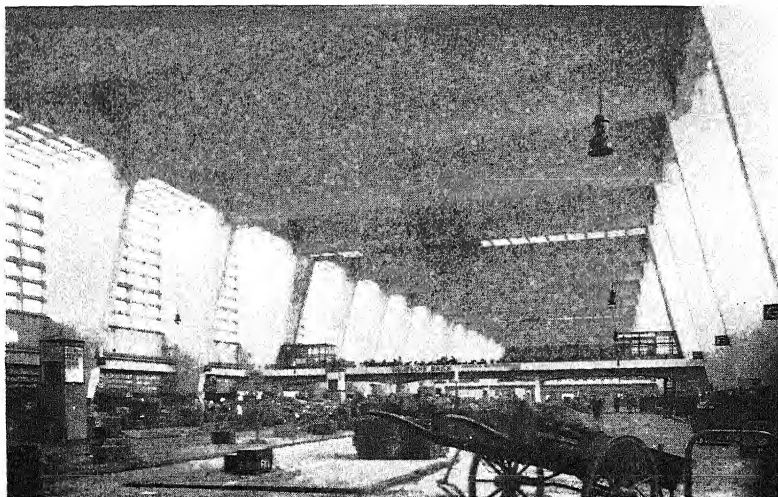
The reinforced concrete structure of the Frankfurt Market Hall, by Professor Elsässer.
